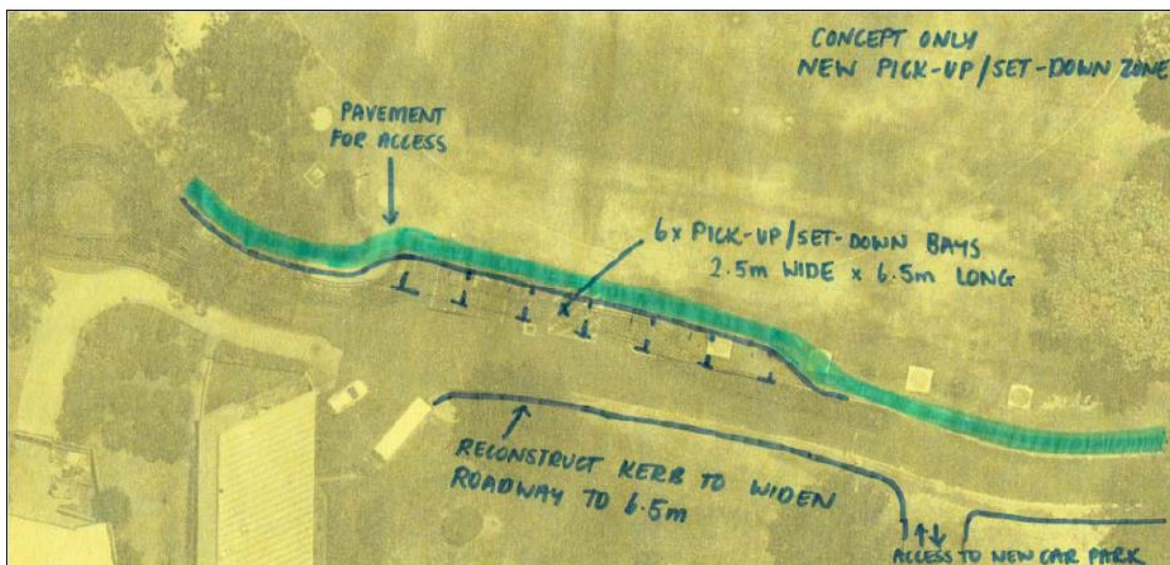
Proposed Pick-Up/Set-Down Design for Primary School
